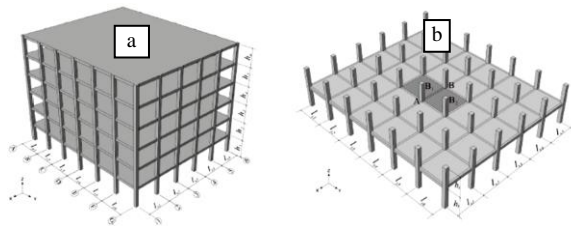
The full-scale reinforced concrete structural frame of the multi-story building considered by Bo Wu and Rujia Zhang 2017 [19]. (a) the whole frame, (b) the third floor.
